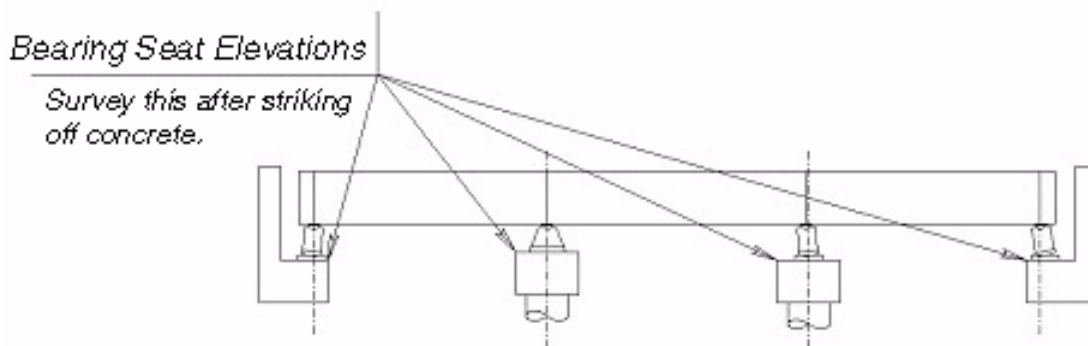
Bearing Seat Elevations (surveyed during concrete placement of the support).
